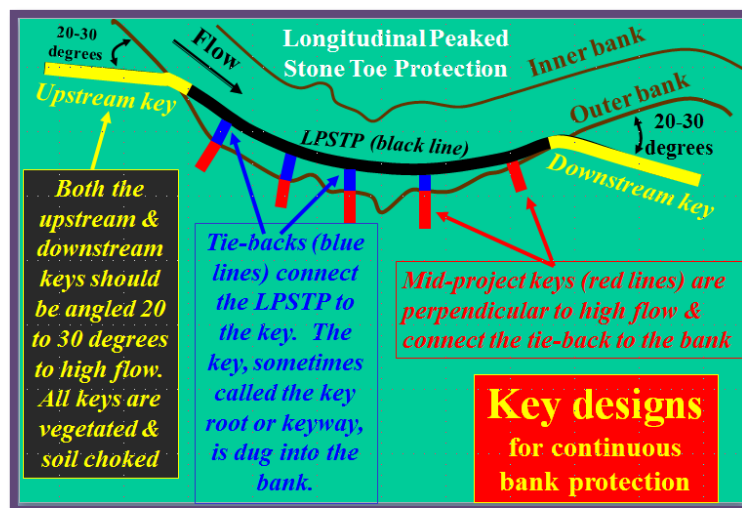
Example Longitudinal Peaked Stone Toe Protection placement and associated supporting structures. Dave Derrick.
